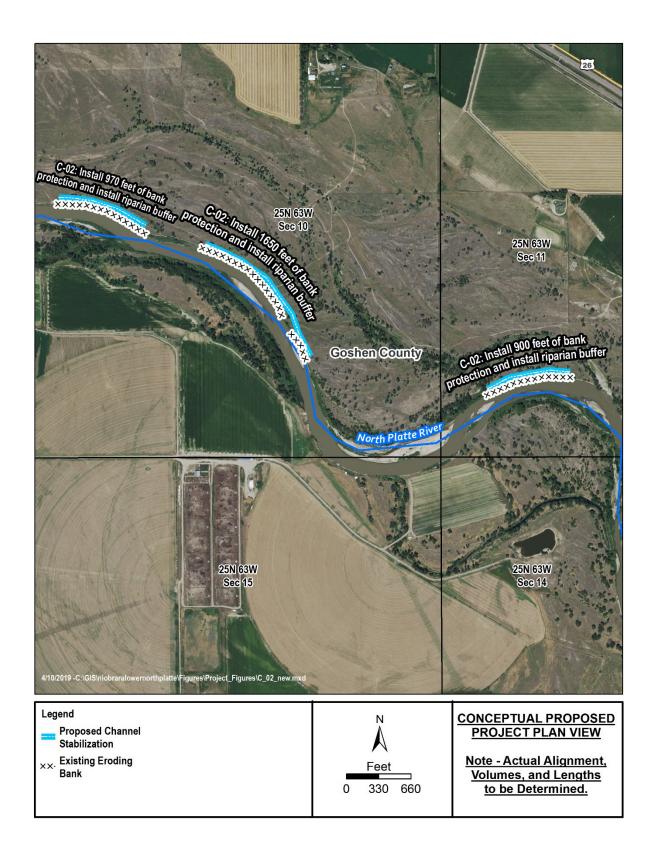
Proposed C-02: North Platte River Bank Erosion Downstream of State Highway 157.
